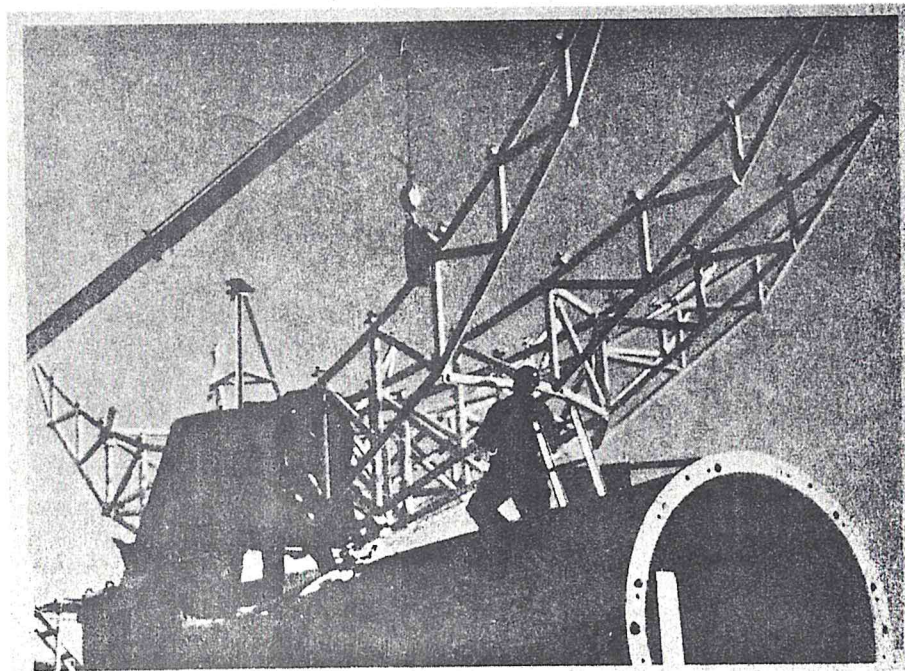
ASSEMBLE REFLECTOR BACK-UP STRUCTURE
